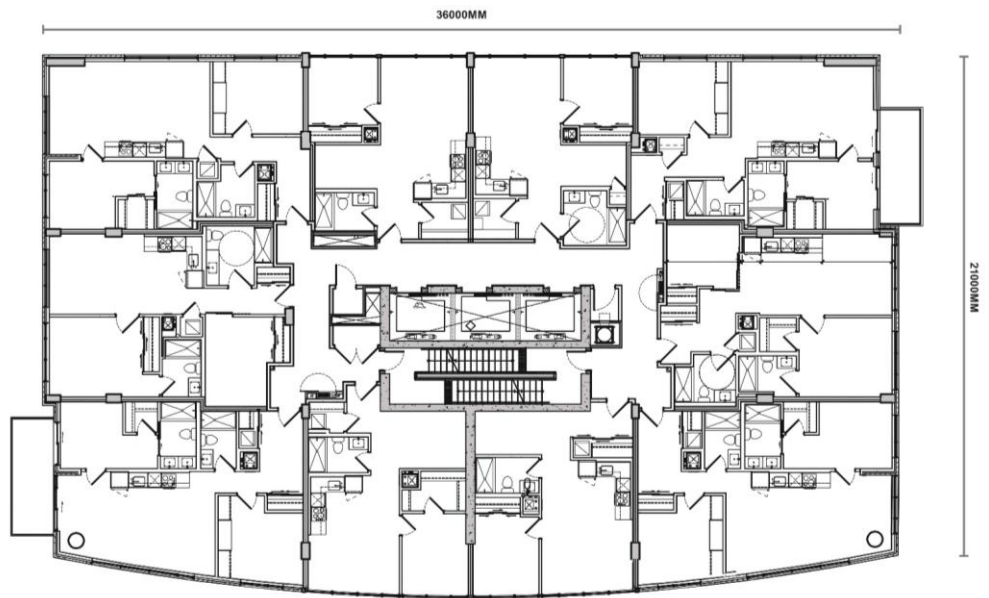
Typical Floor Plans of Tower B4 (NEUF Architects)
